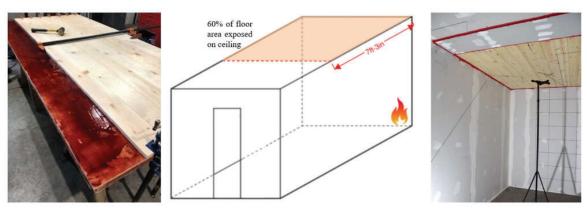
Left to right: Timber panel fabrication with adhesive on plywood. Schematic (not to scale) of Test 5. Timber panel representing 60% of the floor area installed on ceiling prior to conducting Test 5.
